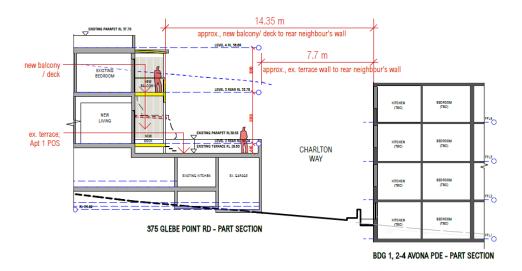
Section plan showing separation between the proposed balconies and the residential apartment building on the opposite side of Charlton Way
